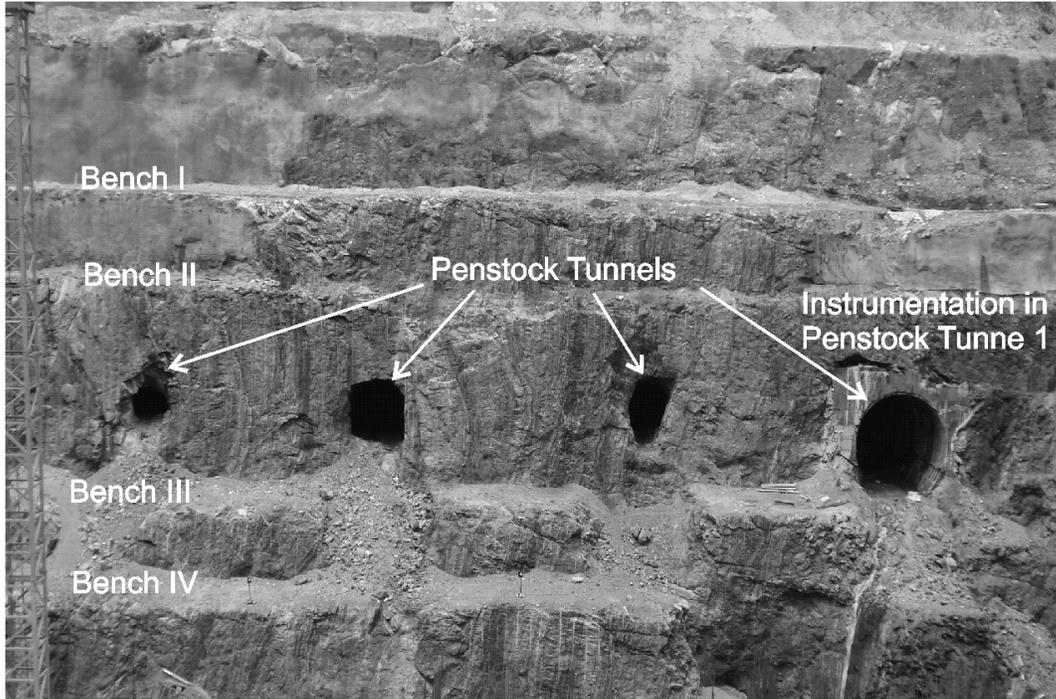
Location of penstock tunnels and the opencut excavation of the power house
